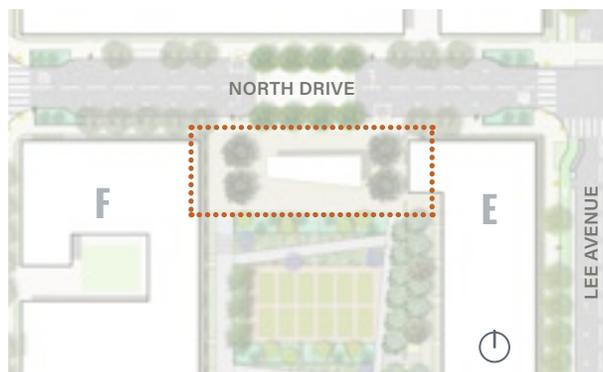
Pavilion Location at North Side of Reservoir Park
